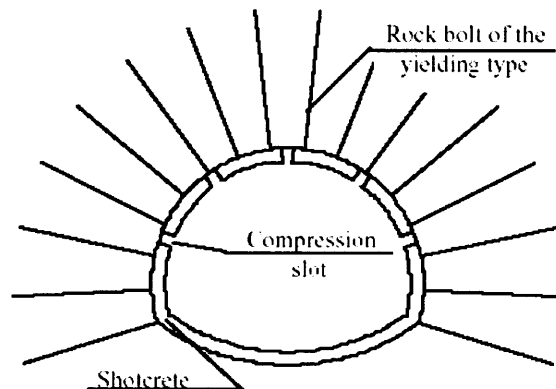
Cross section of a tunnel with compression slots applied in squeezing ground conditions (Schubert , 1996)
